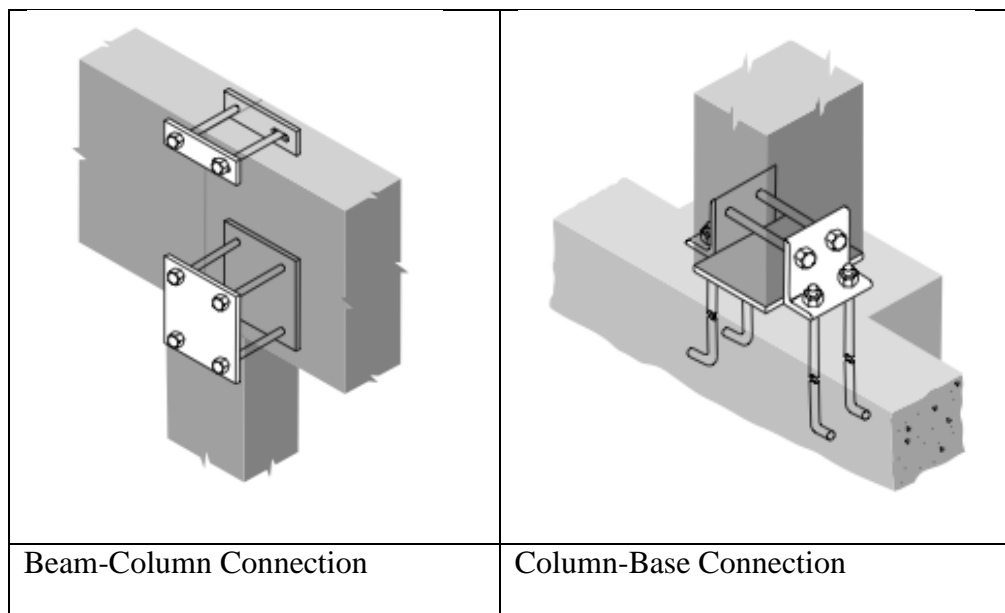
Typical Connection Details (Wood Design Manual, 2010)
